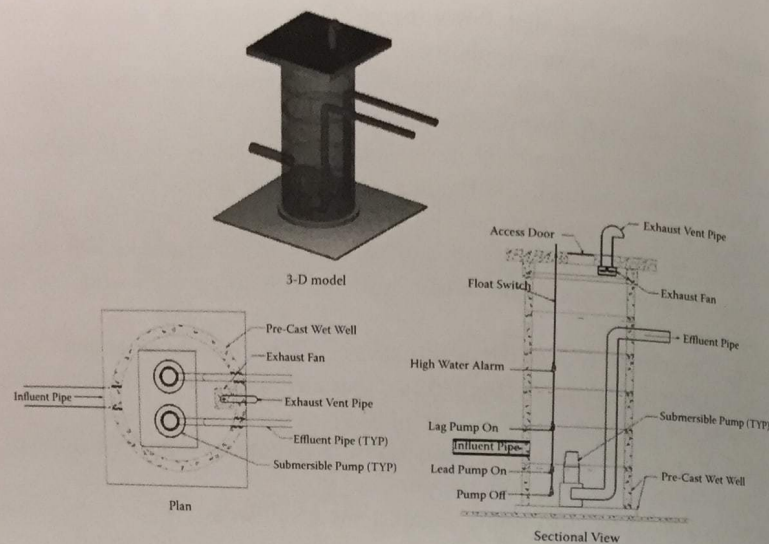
Typical wet well (model, plan, and sectional diagram).
